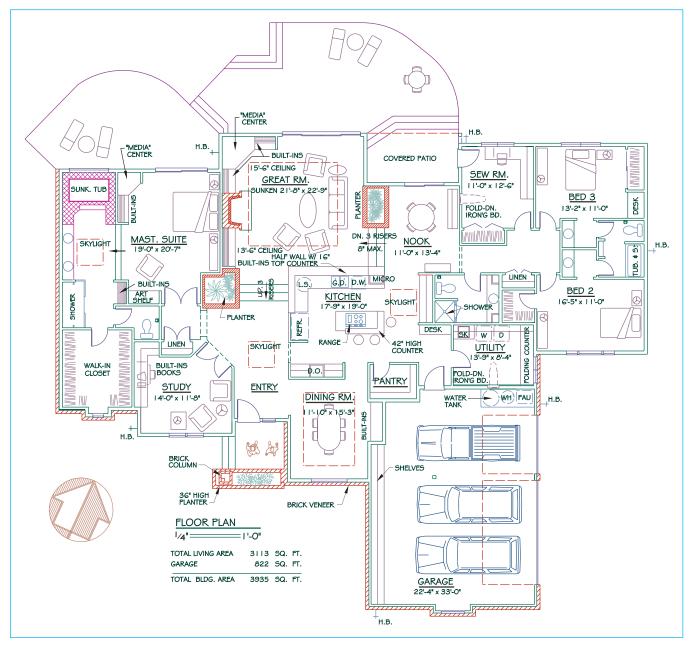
The preliminary floor plan shows the owner's changes, with furniture added.
